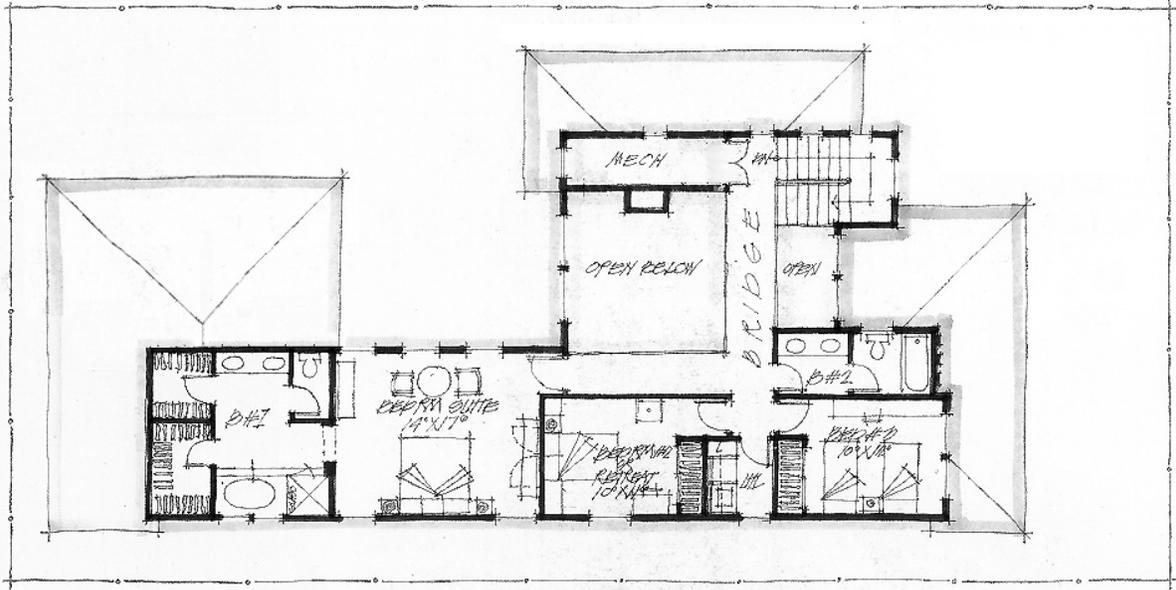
Southern California House Prototype with Alley Access Second Floor Plan
